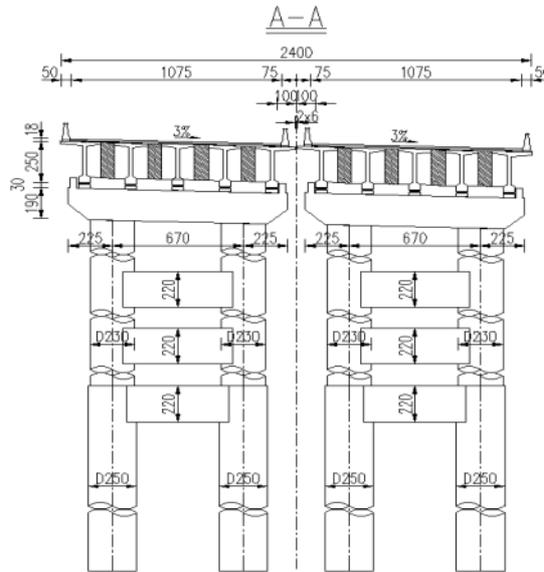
Profile Map of NO.3 Bridge Pier (unit: cm)
